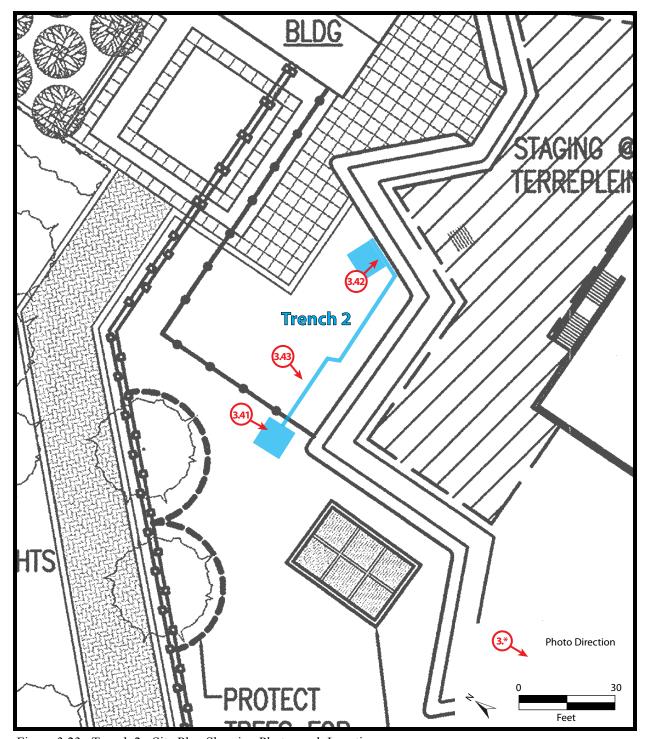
Trench 2: Site Plan Showing Photograph Locations.
